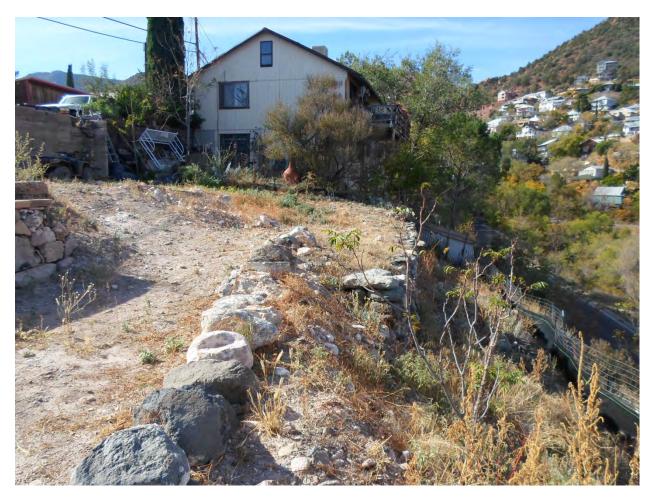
View looking south along the west side of the proposed building area where a small retaining exists. The foundations for the new residence should be at least 5 feet behind this wall.
